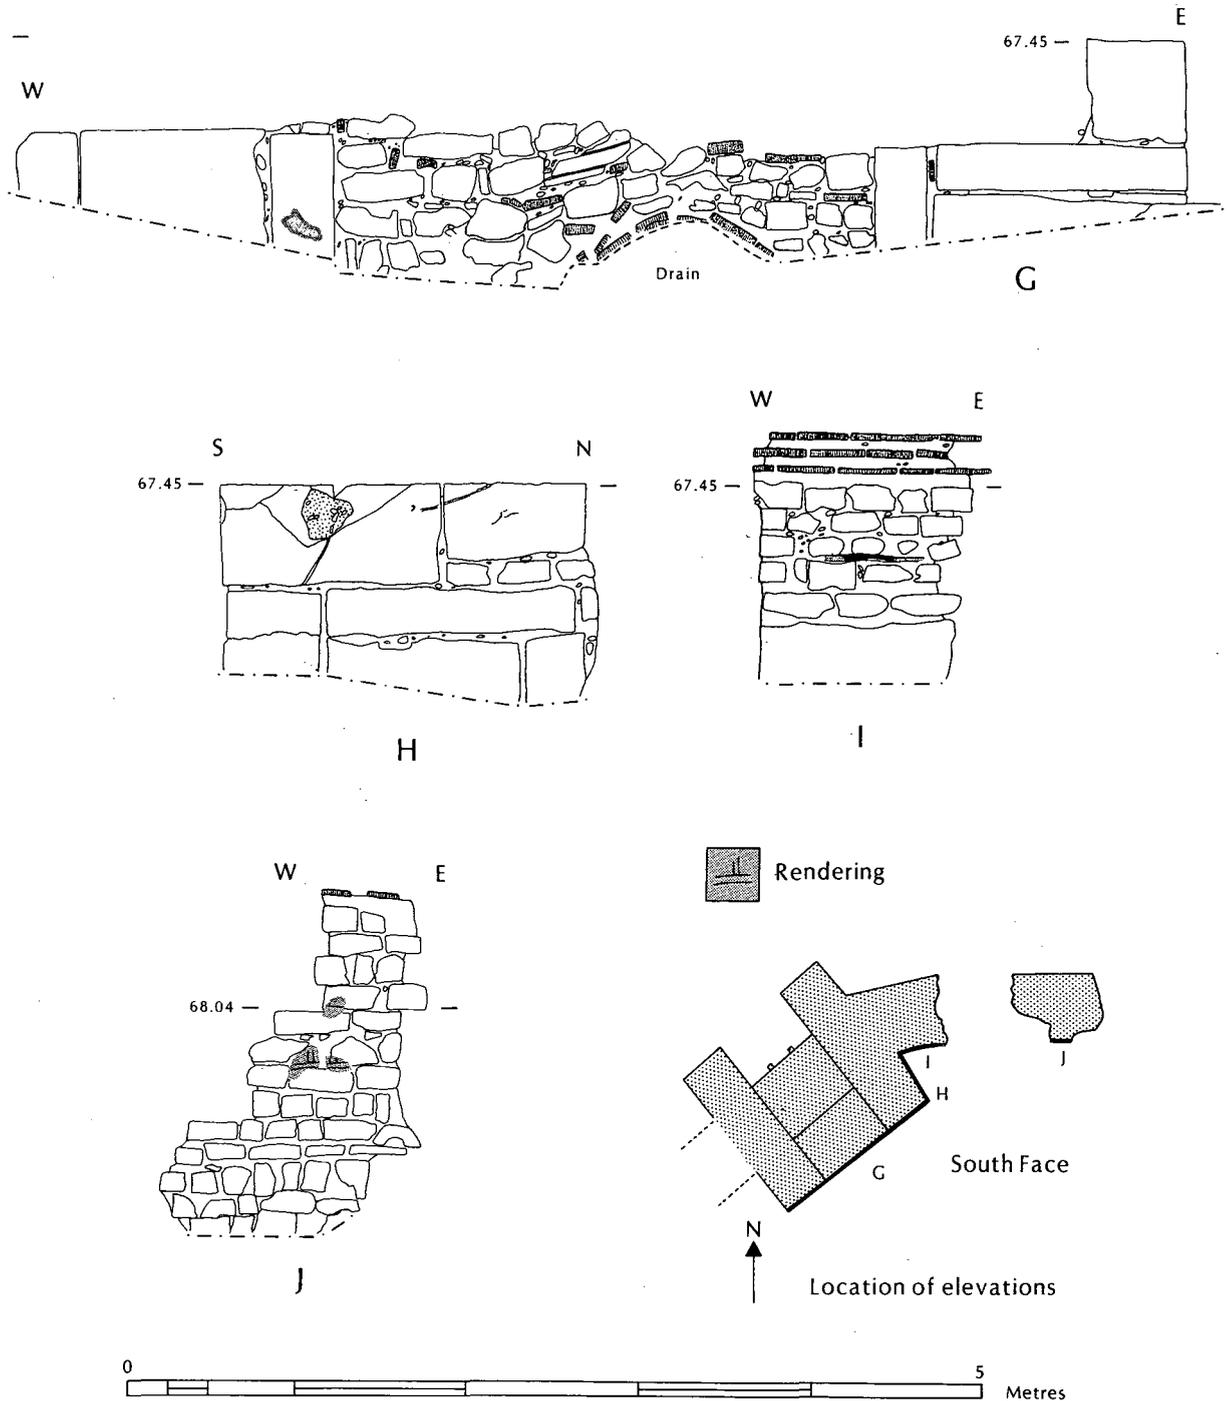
Area E. Elevations of the south side of the curtain-wall.
